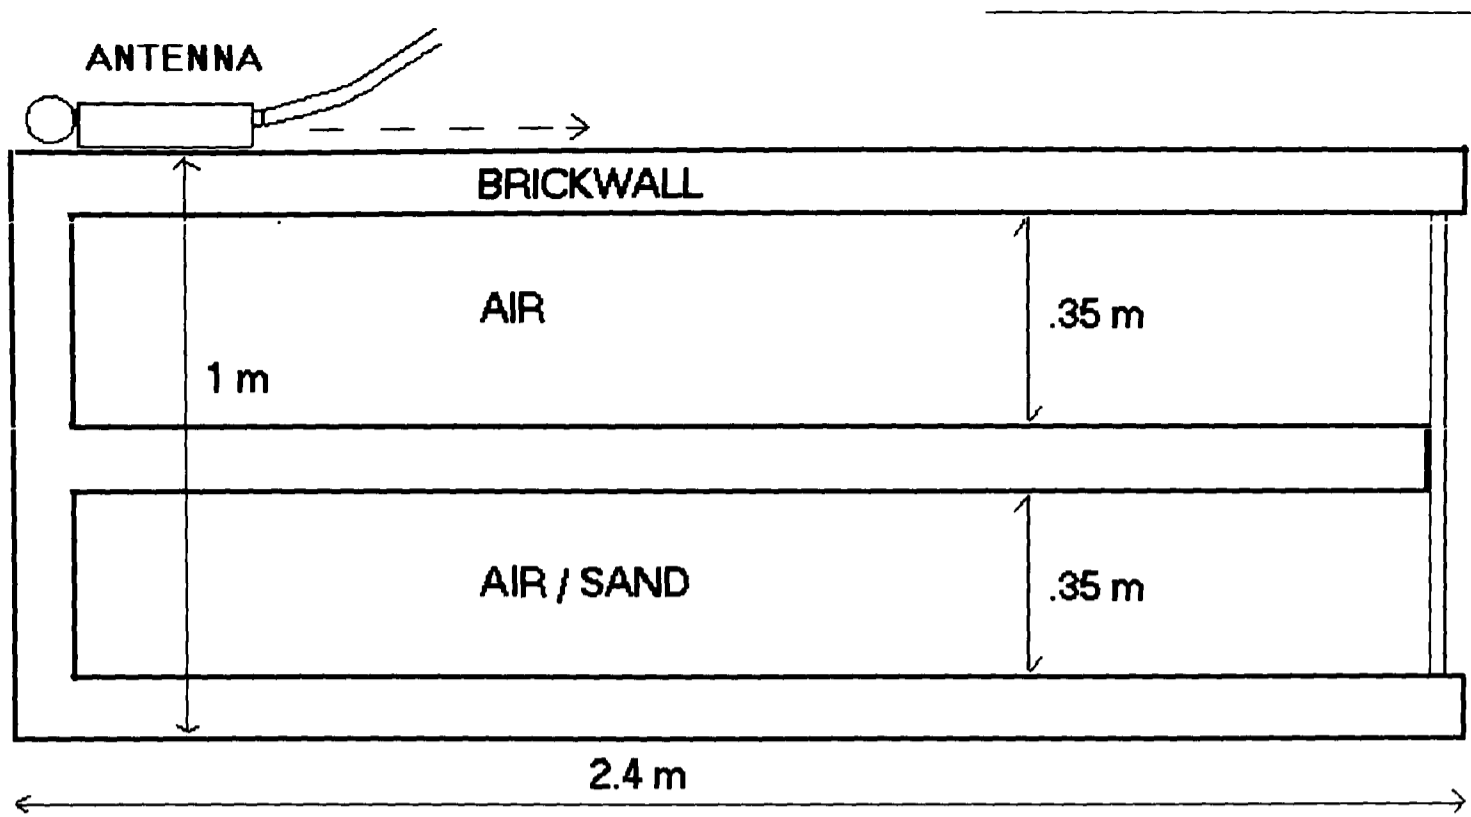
Top view of test rig modelling a composite masonry structure.
